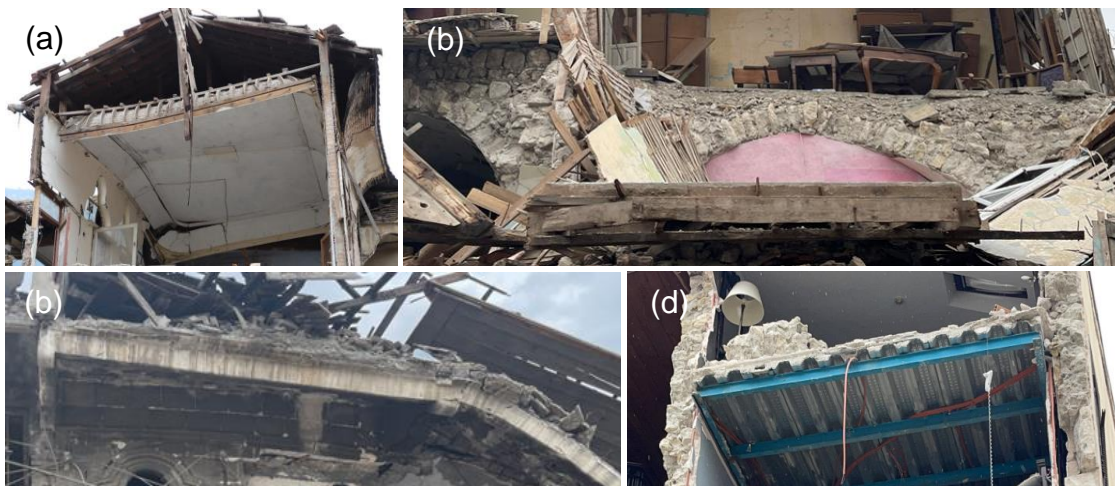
(a) Timber roof, (b) Vaults; (c) RC slabs; and (d) RC slabs supported by steel I beam.
